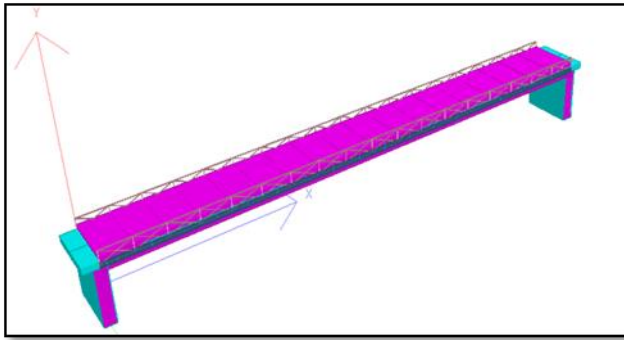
3D View of Bridge with Jacketing as a retrofitting
